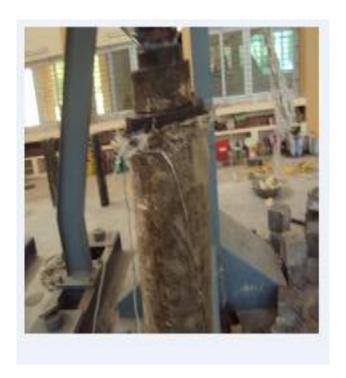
WRAPPING FAILURE OF CIRCULAR COLUMN
